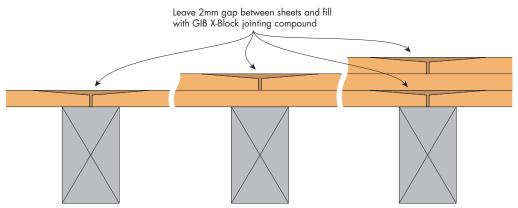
Completely Filling All Gaps and Recessed Joints
